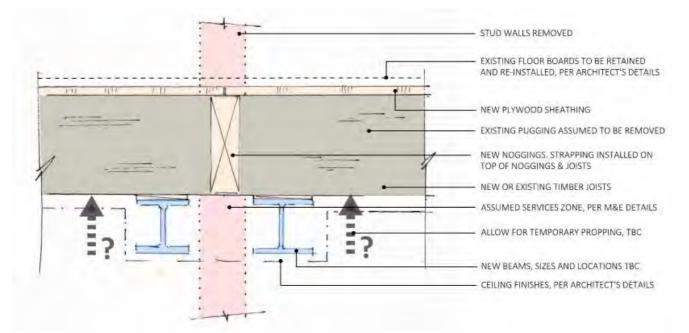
New steelworks installed below existing joists. Using two beams potentially negates the need for propping during the existing wall removal.
